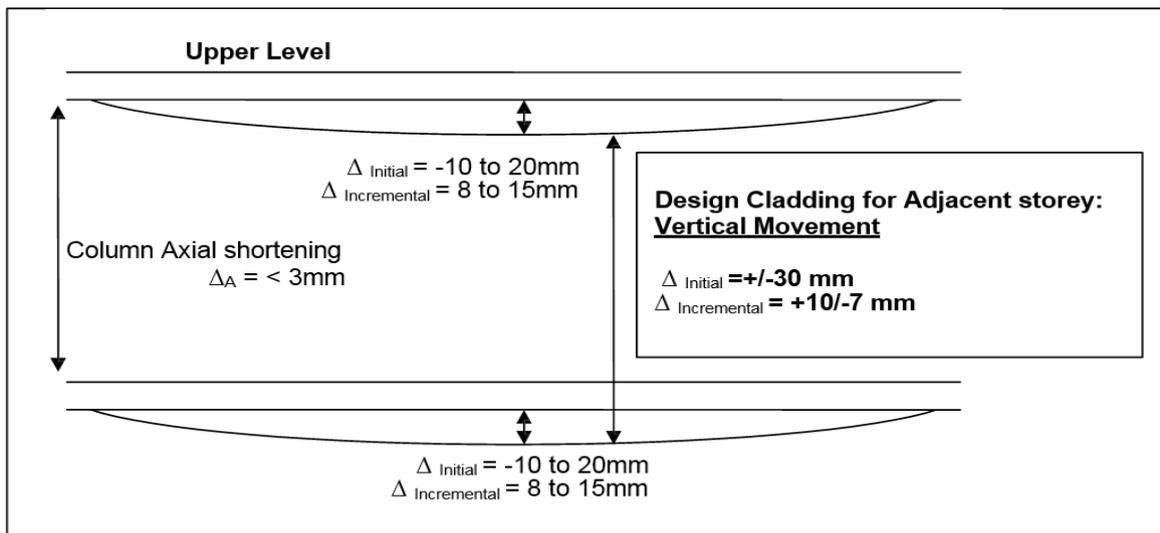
Edge Slab Deflection between Adjacent Floors (Robert Bird Group)
